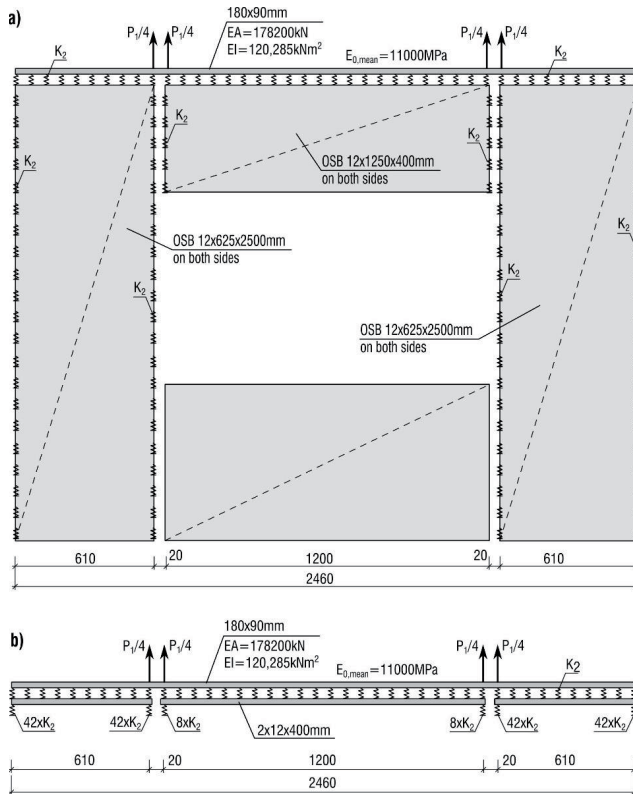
Conversion of wall with opening into corresponding system of beams: a) diagram of sheathing boards connected through springs of fasteners with timber frame and top plate, b) transformation of wall into beam connected with adequate stiffness springs – ACBS model.
